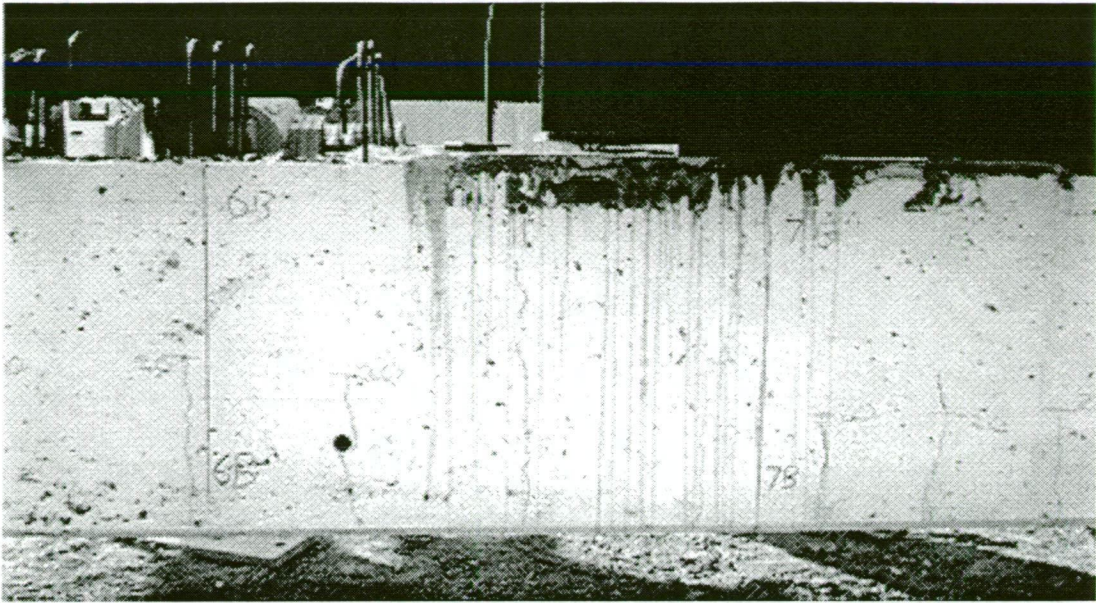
Flexural Beam Crack Patterns
